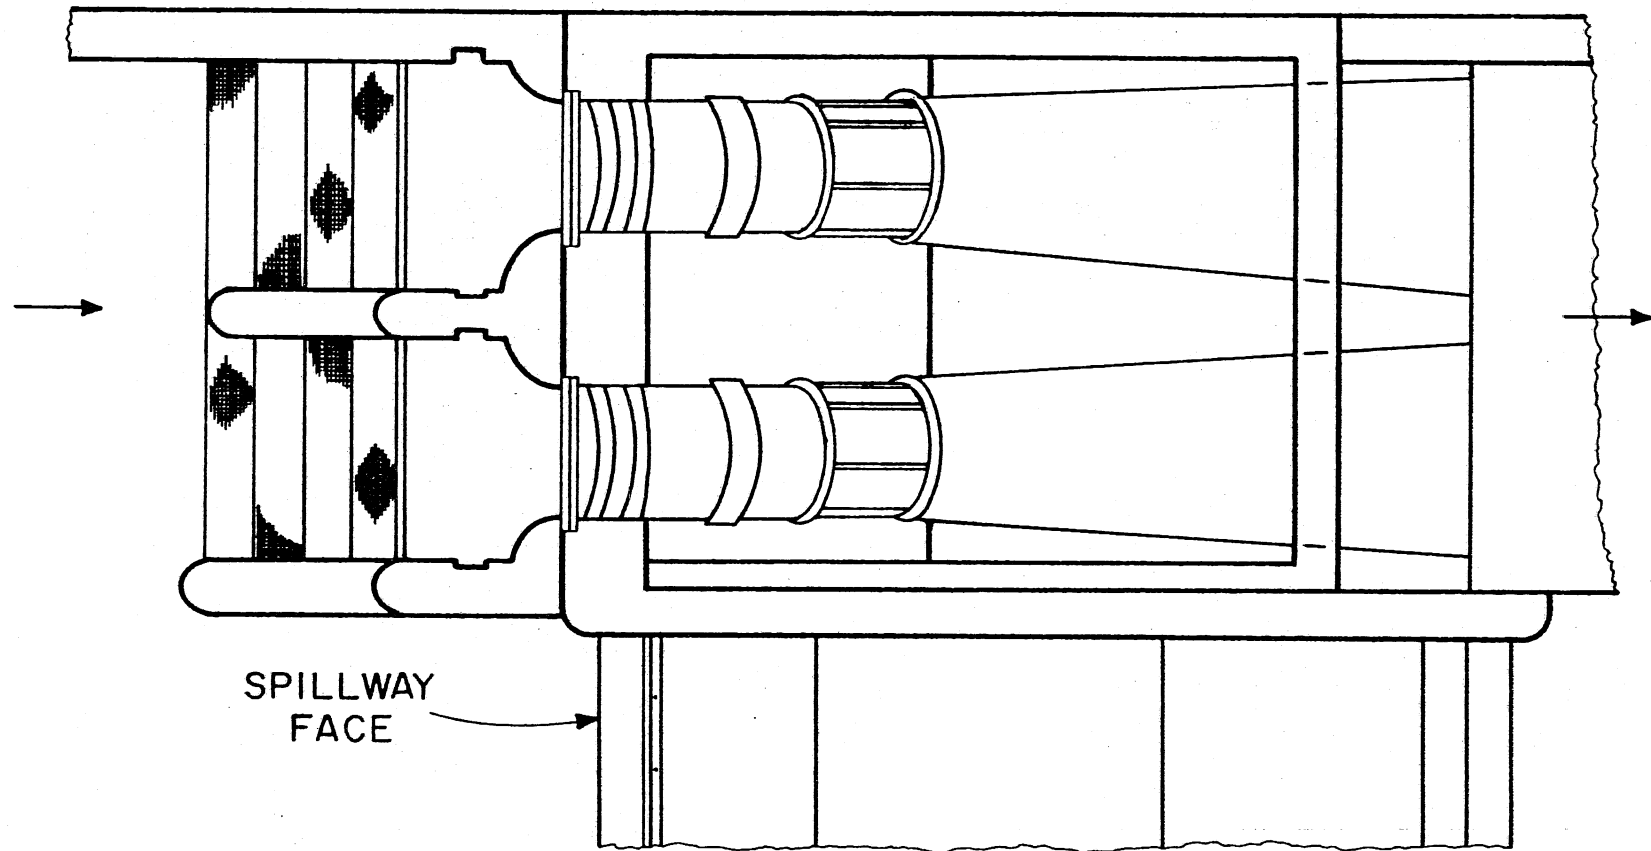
Plan view of Alternative E: two Essex turbines installed in the east abutment of the existing dam.
